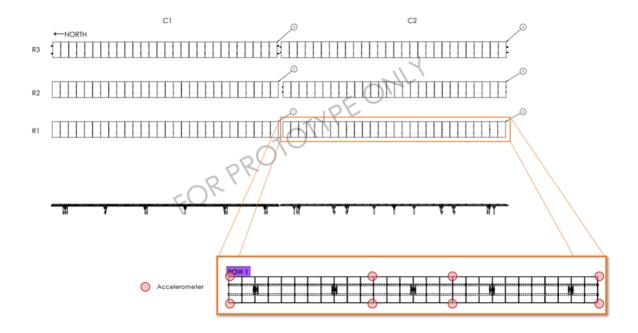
Instrumentation layout for added accelerometers as provided by Sunfolding
